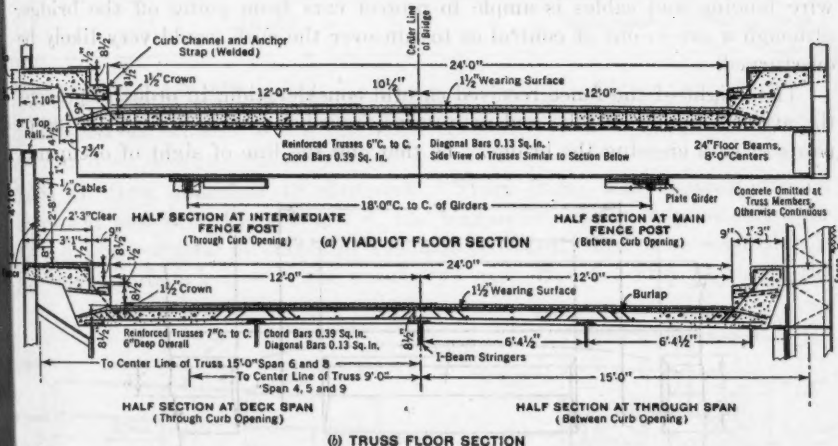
CROSS-SECTIONS OF FLOOR, LAKE CHAMPLAIN BRIDGE
